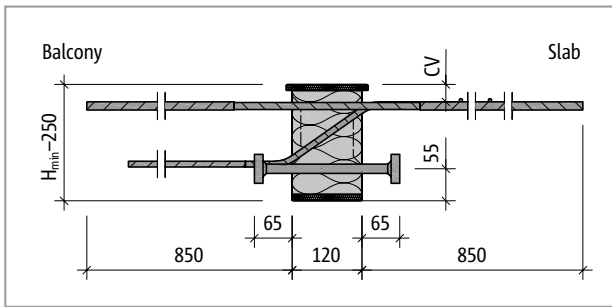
Schöck Isokorb® XT type K-M11: Cross-section of the product
